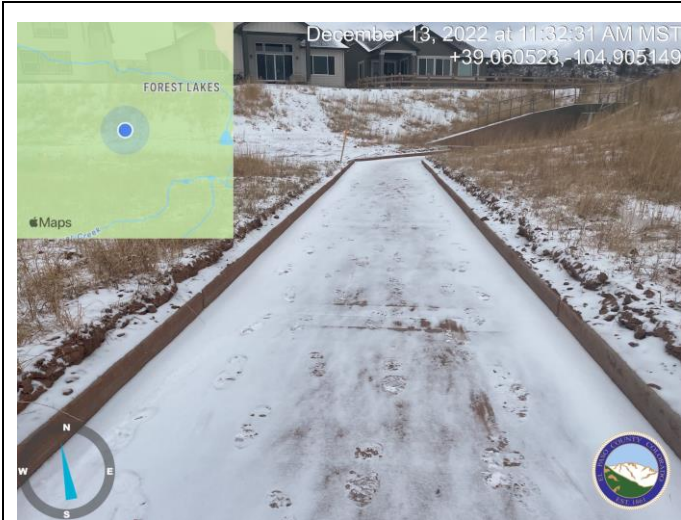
Remove sediment from trickle channel. Lower pond bottom to top of trickle channel curb with a 3% slope towards trickle channel for positive drainage.
